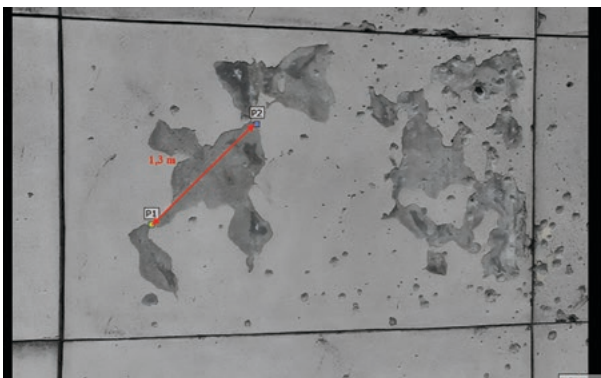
| Determination of a characteristic facade defect dimension using photogrammetry
